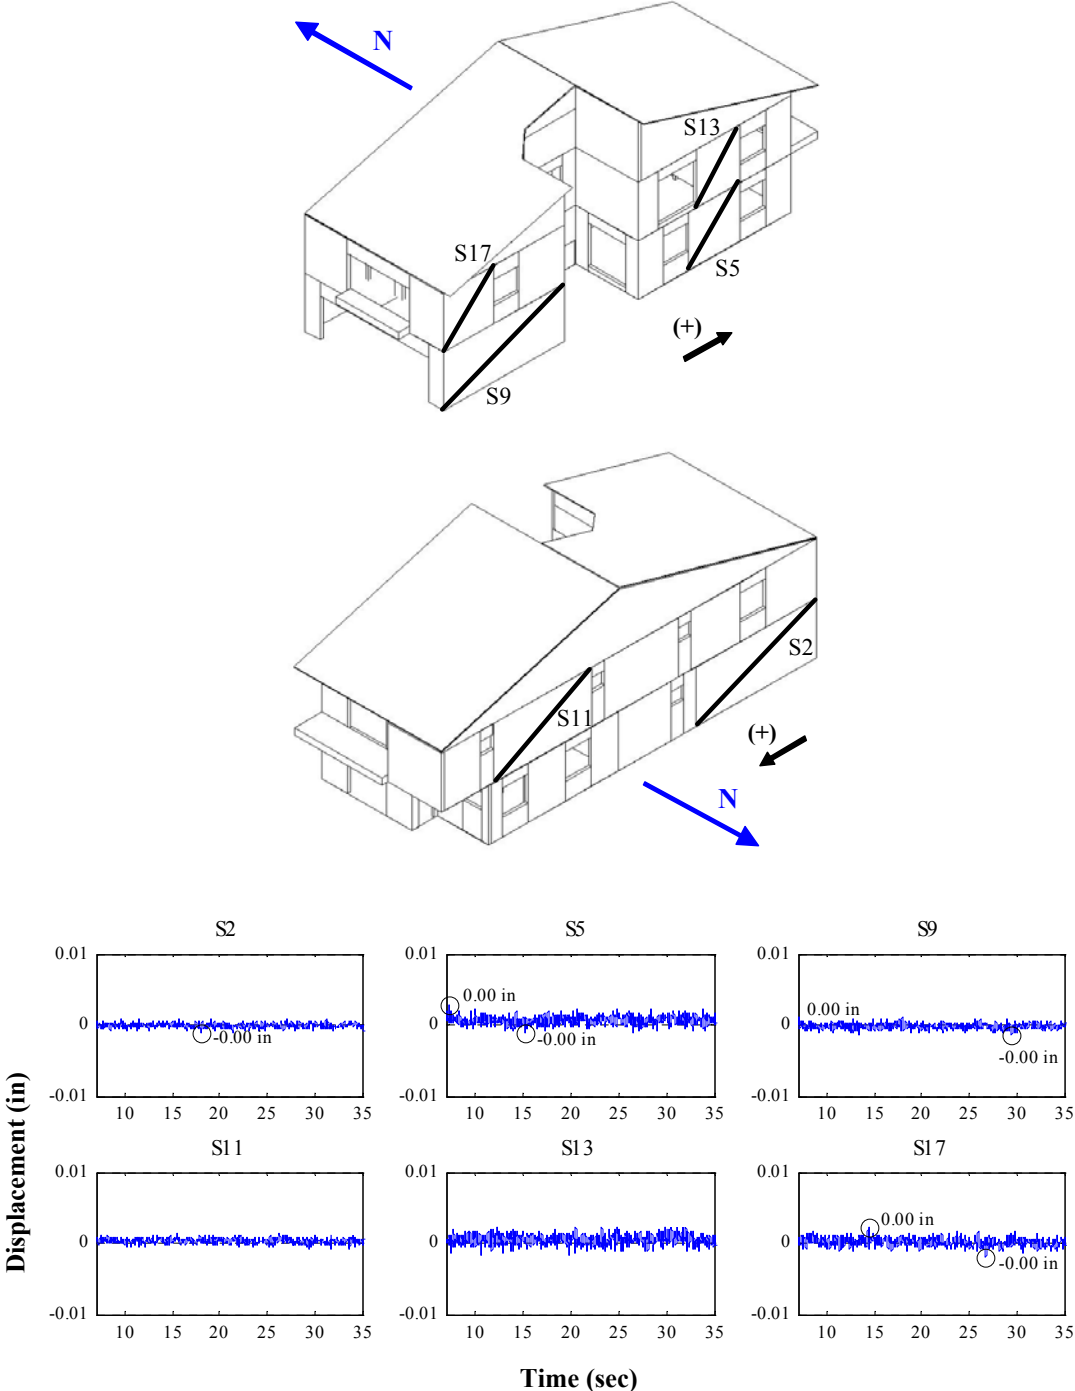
Wall deformations of east-west external walls for Test NWP1S03
